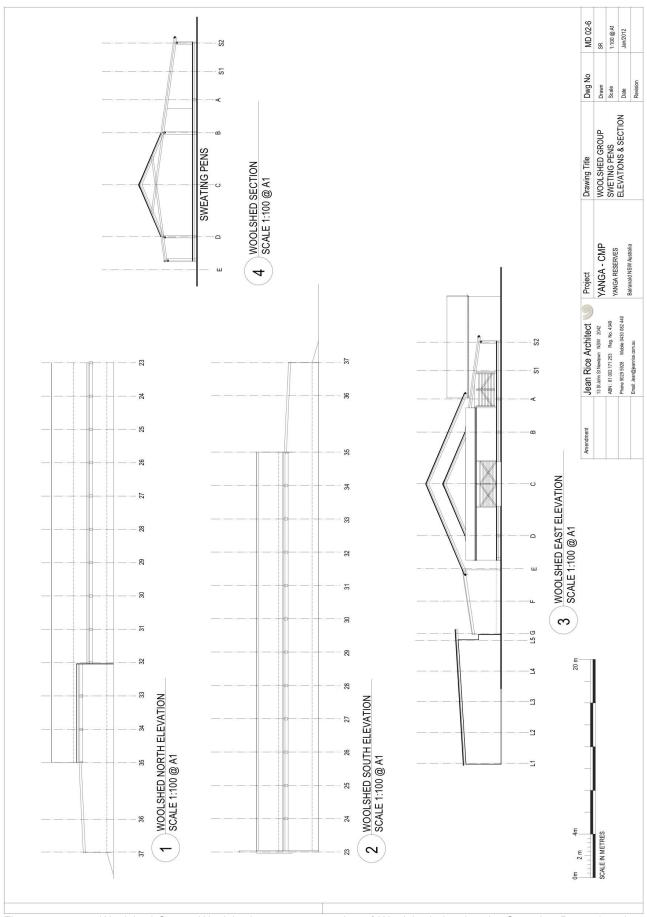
Woolshed Group. Woolshed - east-most portion of Woolshed showing the Sweating Pens elevations and cross section. Jean Rice Architect, site assessment 2009.
